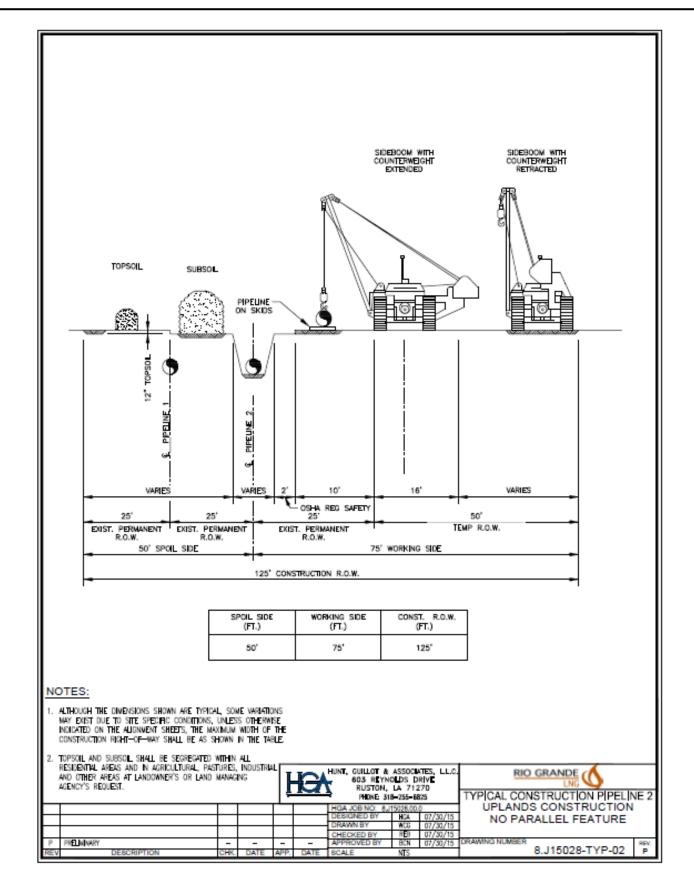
Typical Right-of-Way Cross-Section of Pipeline 2 Construction
